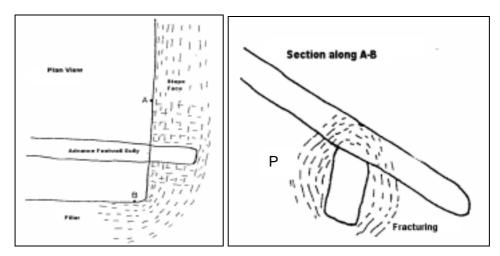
The likely fracturing around a gully-width advance heading developed in the footwall of the stope (after Turner, 1987).
